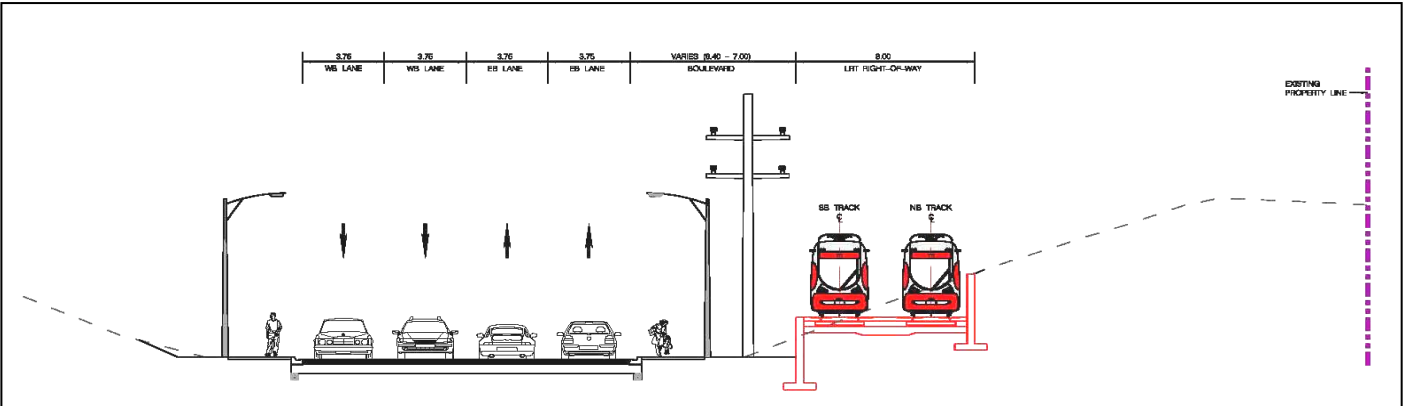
Cross Section – Morningside Avenue Bridge over Highland Creek
